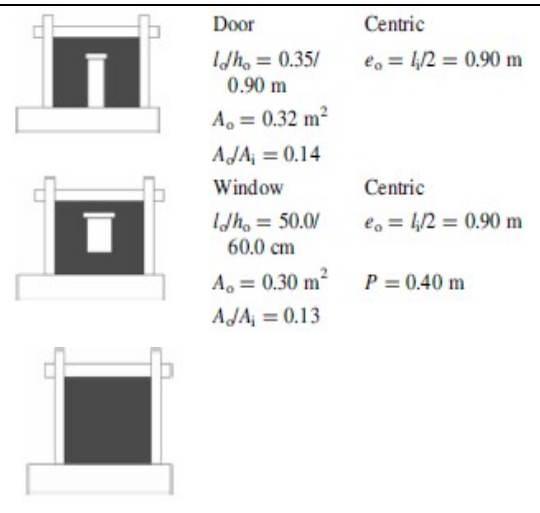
Masonry infilled R/C frames specimen and design details [16].
